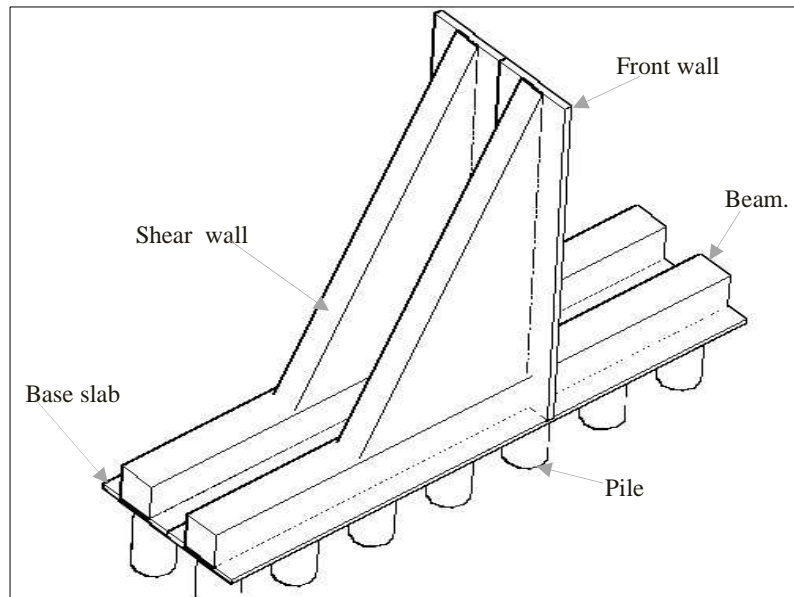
A Portion of Retaining Wall against Tsunami
